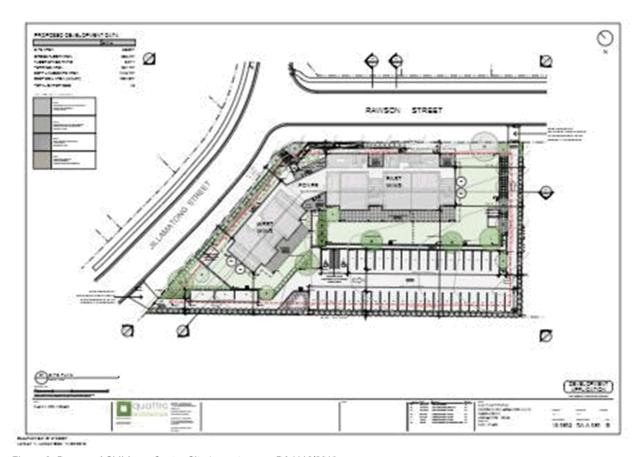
Proposed Childcare Centre Site Layout as per DA4116/2019
